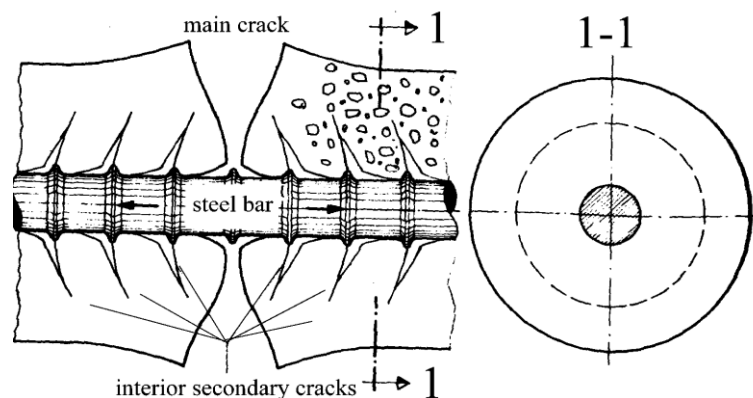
Crack formation during tension test of a reinforced concrete prism (Tejchman & Bobinski, 2014).
